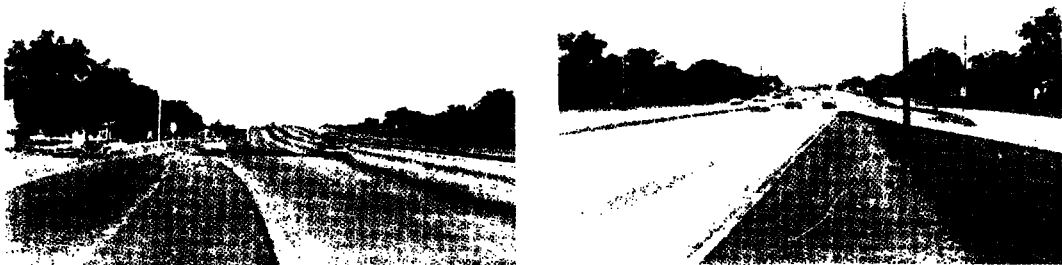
On-ramp inbound from Metropolitan Drive, South Central Expressway, Dallas: Left—view from auxiliary lane, and right—view from freeway.
